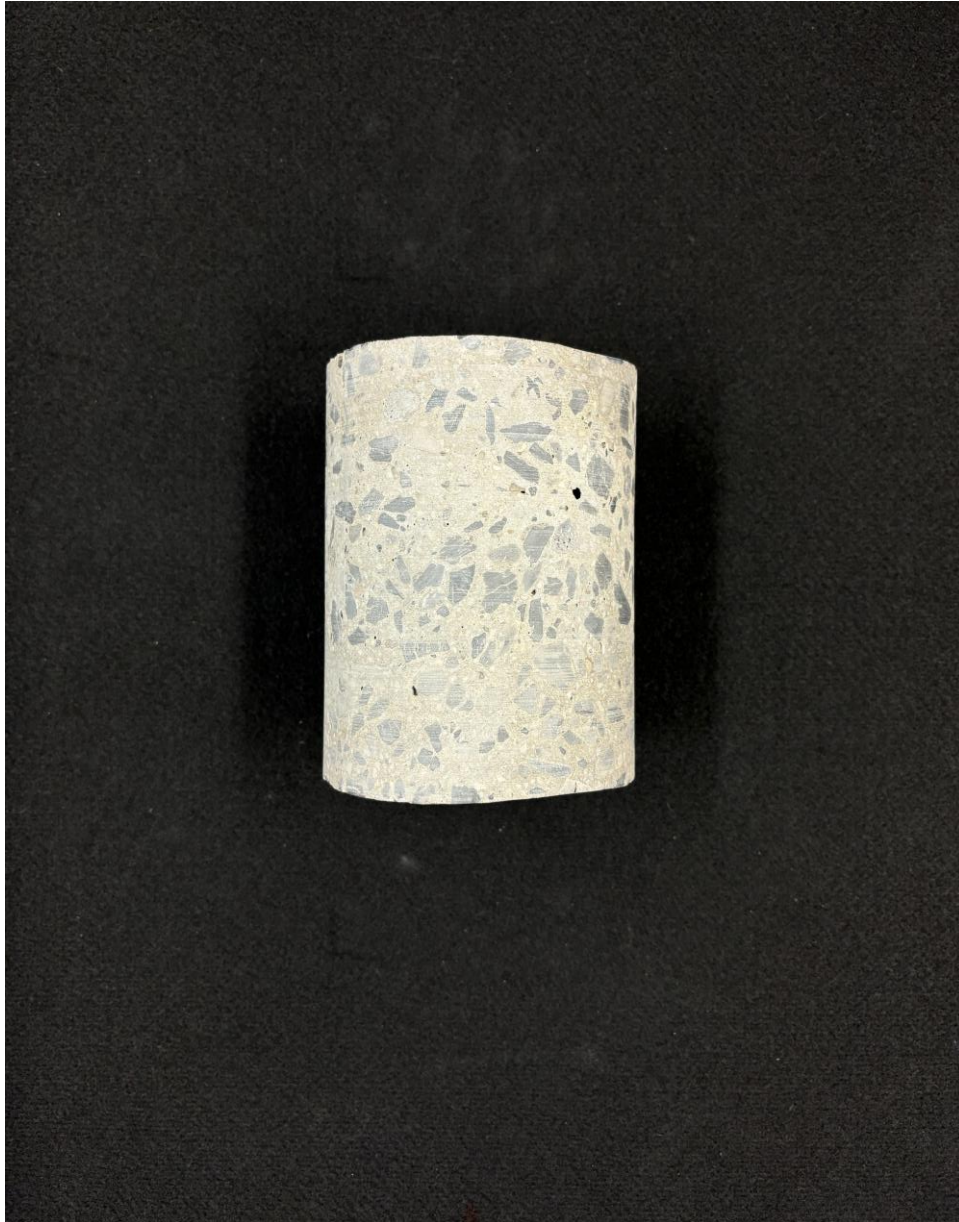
Core 1 of lightweight concrete deck at bridge C-989.
